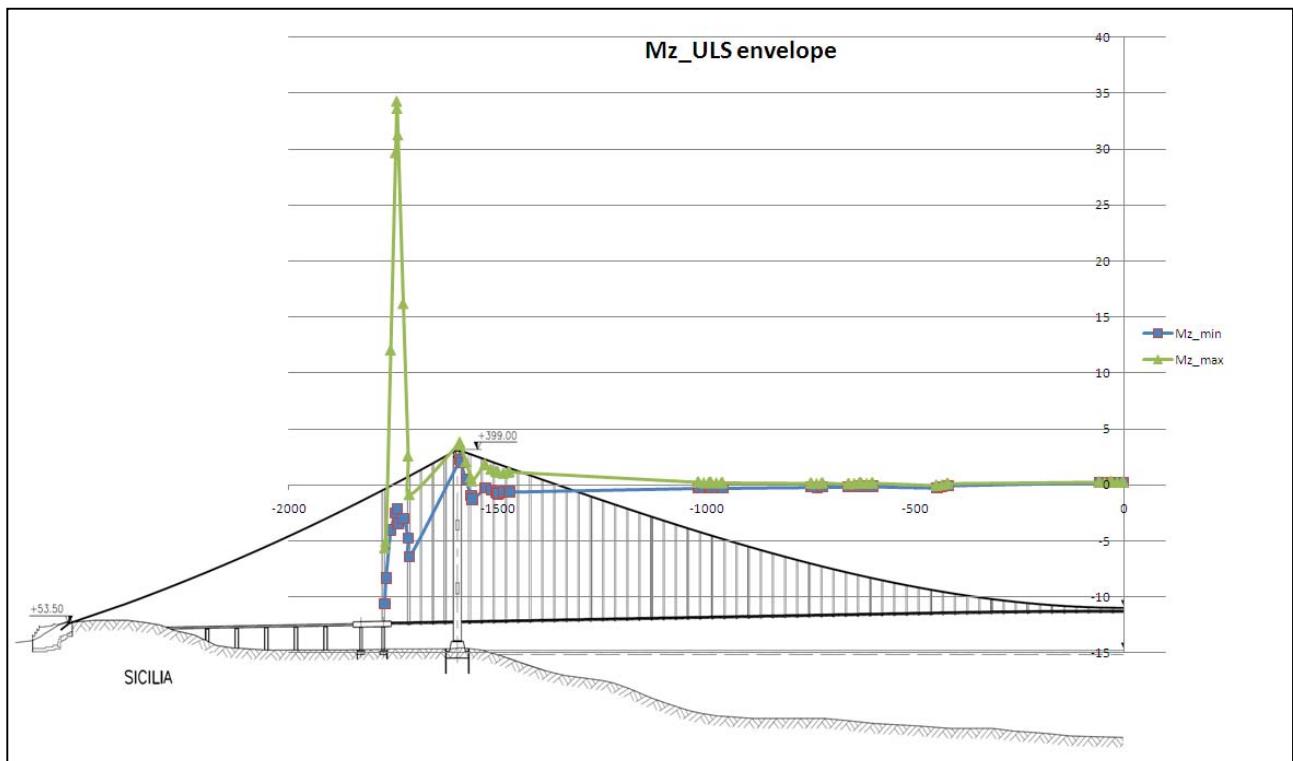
Sectional forces in road girder for rupture of hanger 3, Moment (MNm)
